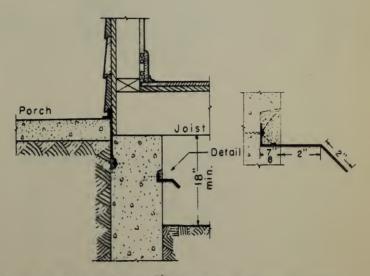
PATENTED SHIELD ON WALL AND PORCH
